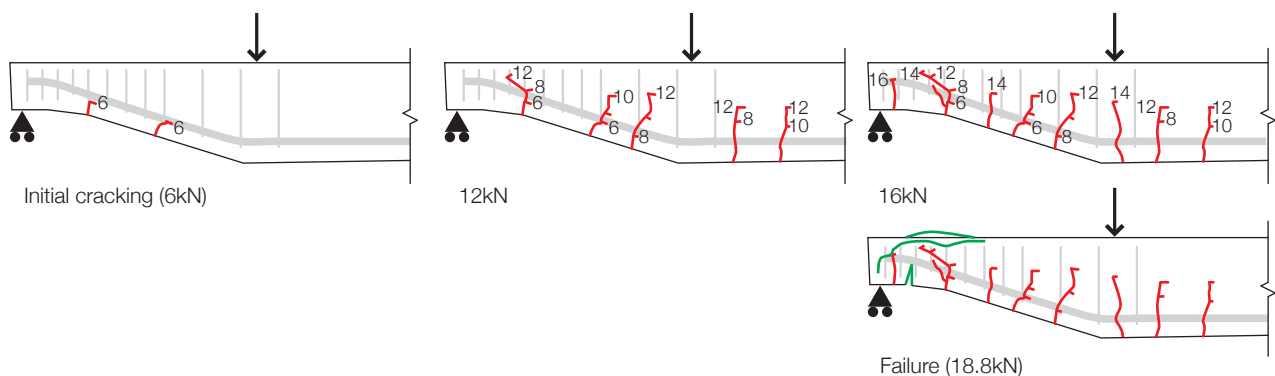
Crack location and progression in Beam 9\_3\_EC2\_M.
